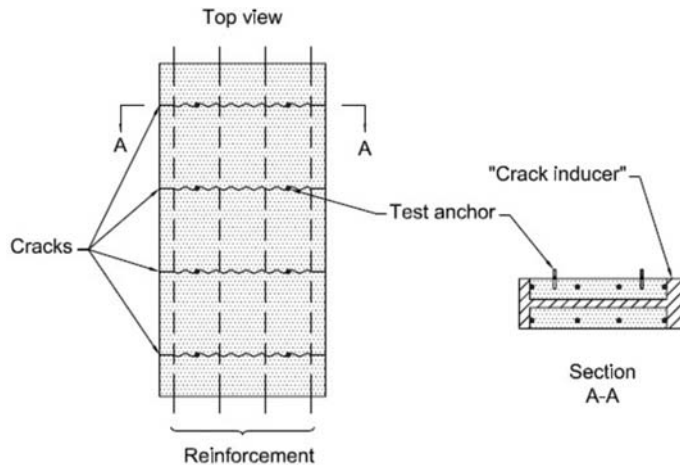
Example of Test Member for Testing in Cracked Concrete
